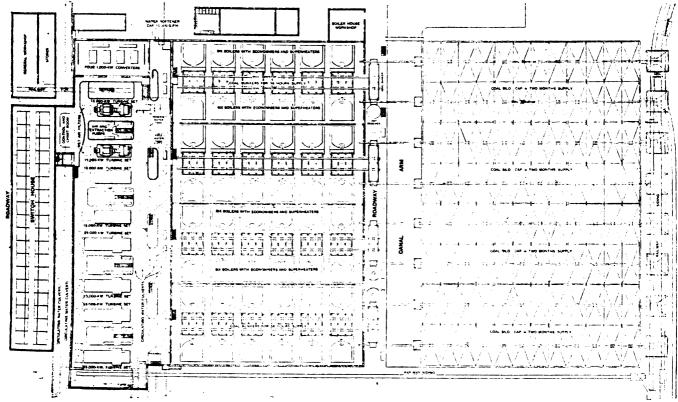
PLAN OF THE PROPOSED BARTON GENERATING STATION, MANCHESTER, COMPLETE WITH COAL SILOS, &C.
